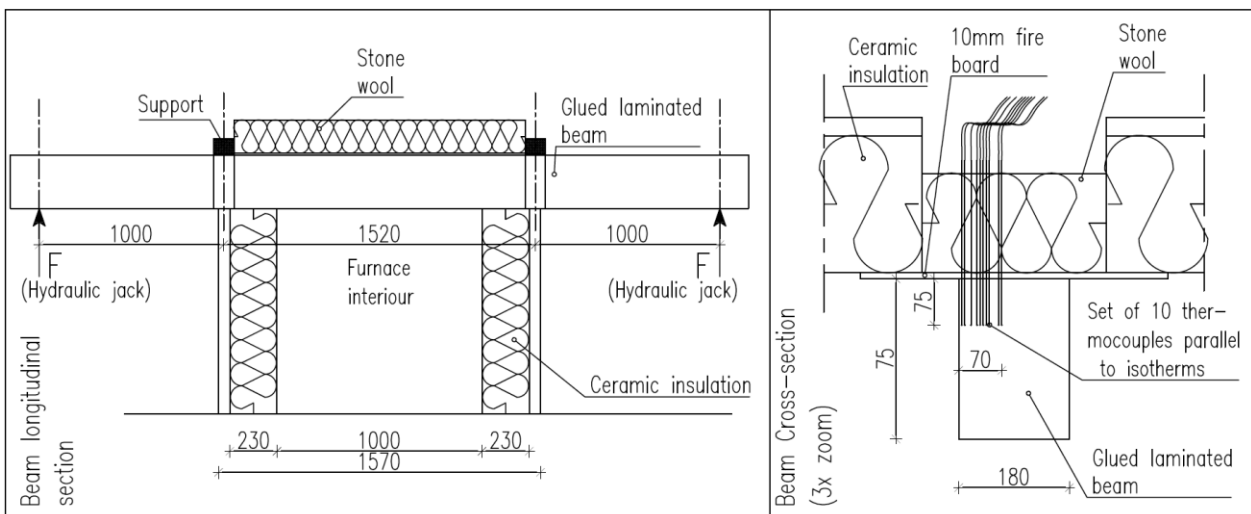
Longitudinal section (left) and cross-section (right) of a glued laminated beam in a four-point bending test on top of a model-scale furnace
